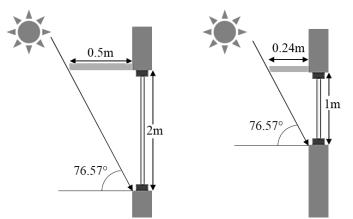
Recommended Depth of Horizontal Overhangs for South Oriented Windows a Section View (by author)
